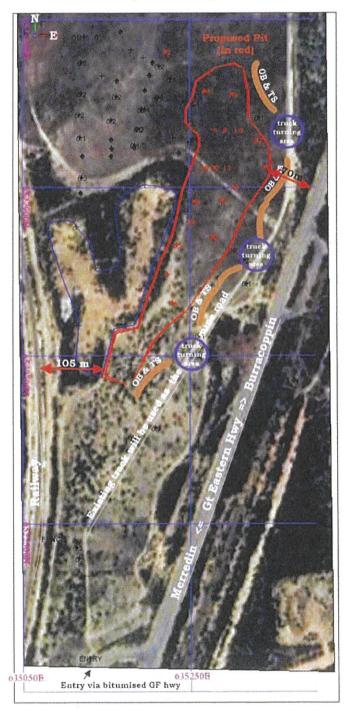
Burracoppin Gravel Pit - proximity to road & rail
